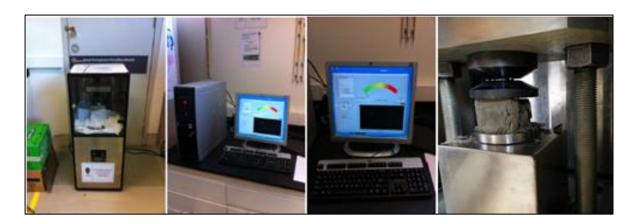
The compressive strength test machine and a sample crushed.
